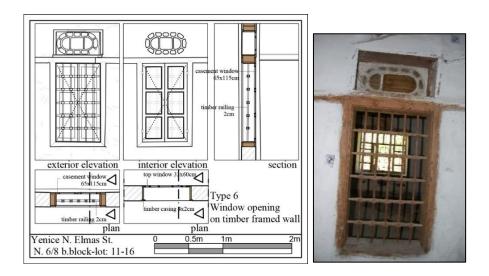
Drawing of window opening located on timber framed wall; Type 6 (left), Window opening with top window (right) (Yenice N. b. block-lot: 11-16)
